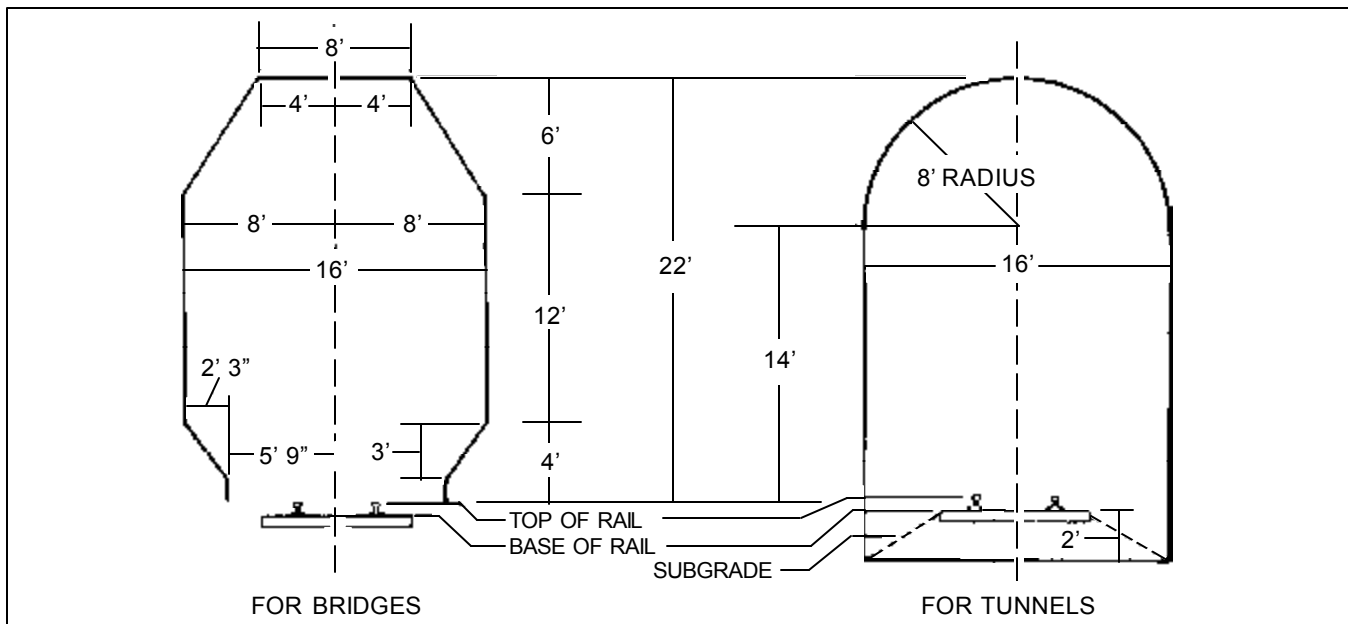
Standard minimum clearances – single-track bridges and tunnels
